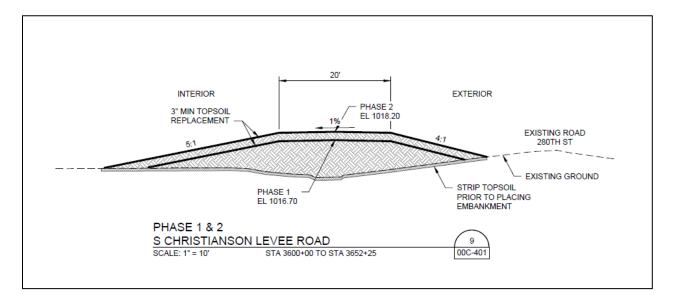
Typical Section of Proposed S Christianson Levee Road - Altering Existing 280th St
